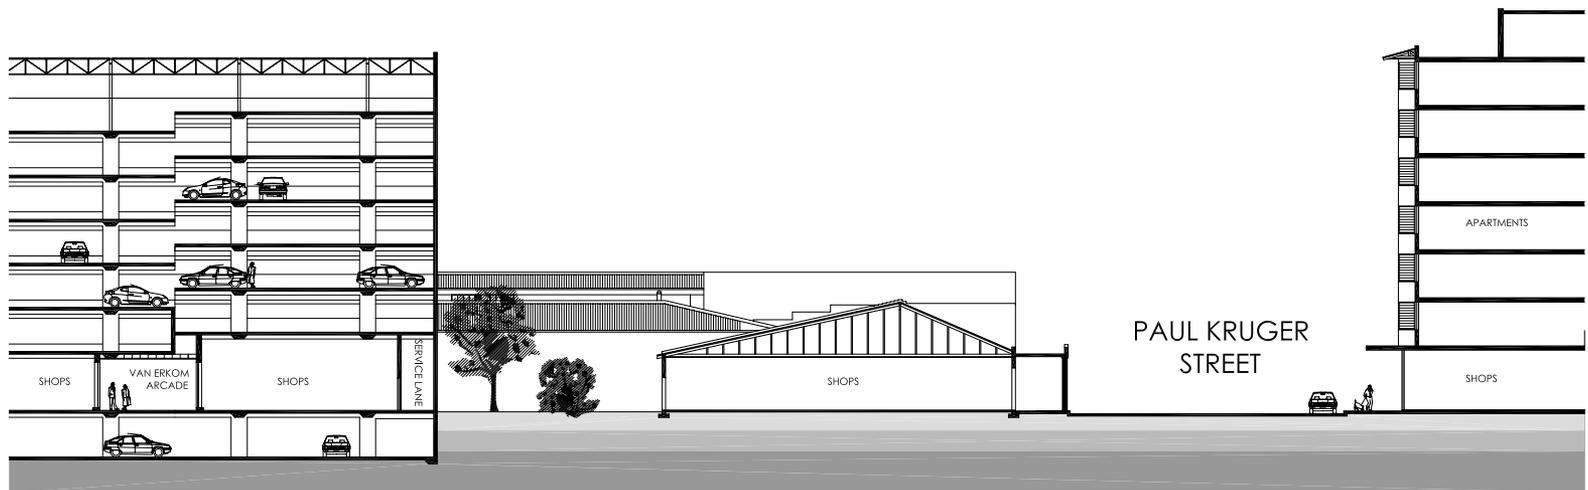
SECTION THROUGH PHARMACY AND FINPARK BUILDING EDGE
